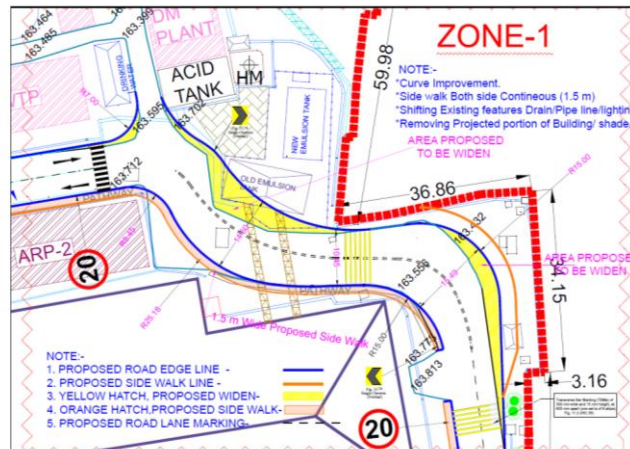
Proposed Infrastructure Improvement Proposal at Zone-1
